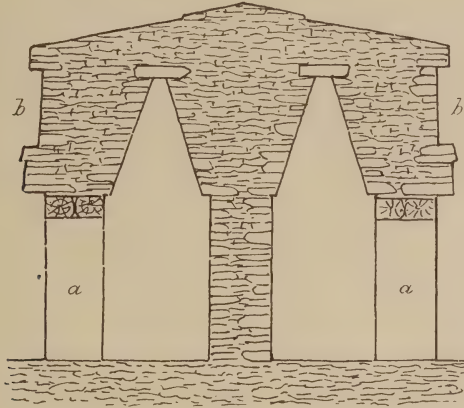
TRANSVERSE SECTION OF THE MURAL TABLET BUILDING.
